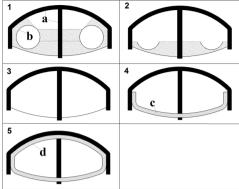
Construction stages of main underground space (a: arch frame with additional middle column; b: TBM lining; c: invert part of final lining; d: crown part of final concrete lining)
